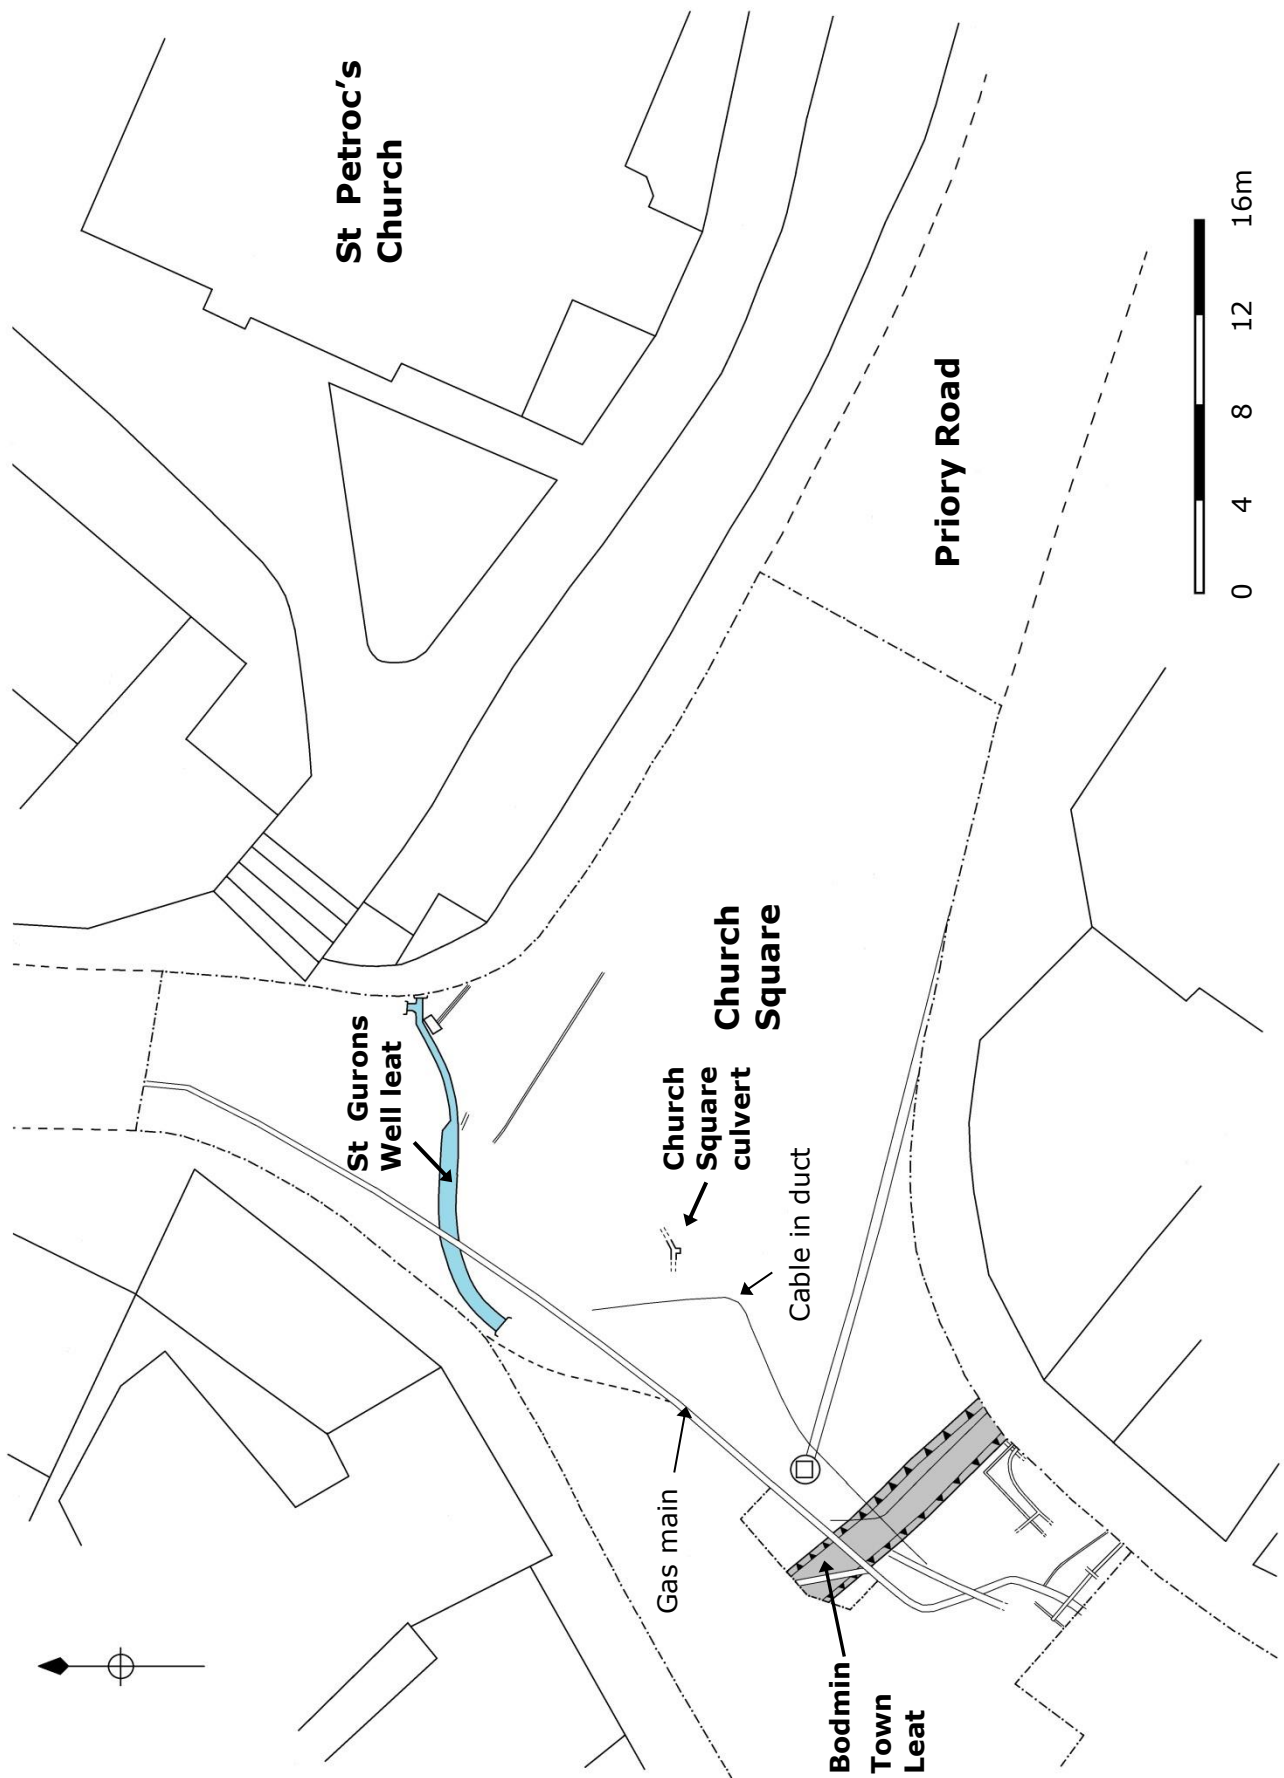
Scheme 5. Church Square. Site Plan showing features located.
